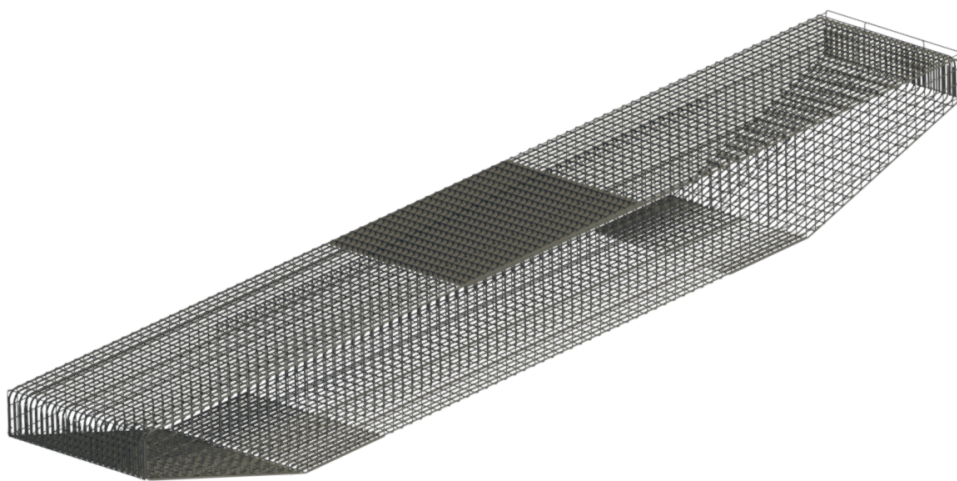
“Las Arenas Viaduct” virtual model, header beam, reinforcing bar detailing view.
